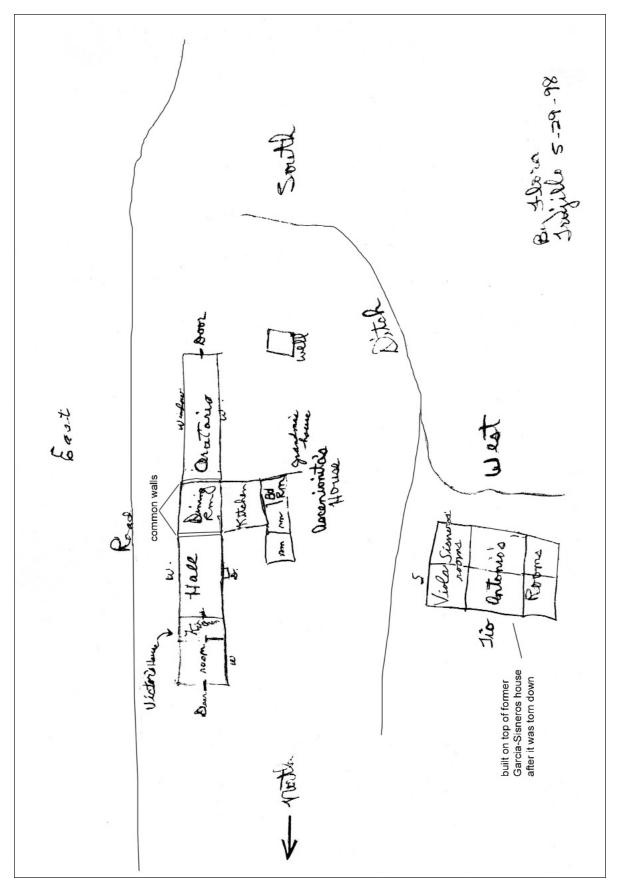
Adaptation of Flora Trujillo's 1998 sketch plan of the García-Sisneros house and oratorio at Gavilan.
